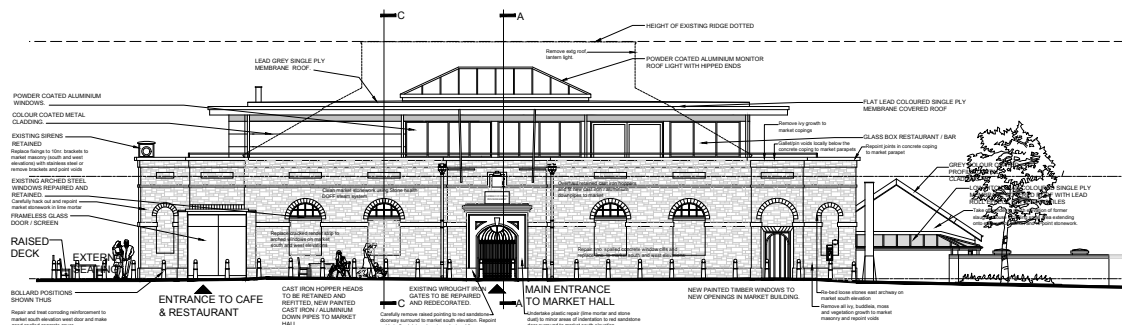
above: Consented south west elevation – source Pembroke Design Ltd
